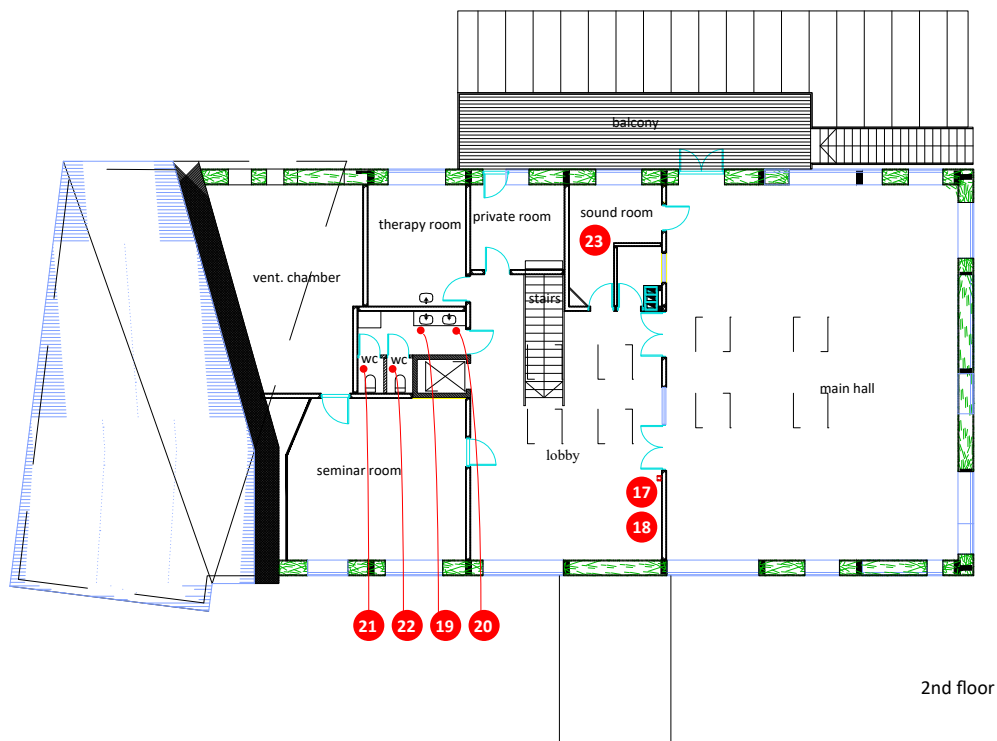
Waste bin setup on the second floor of the training center, in design proposal experiment.
